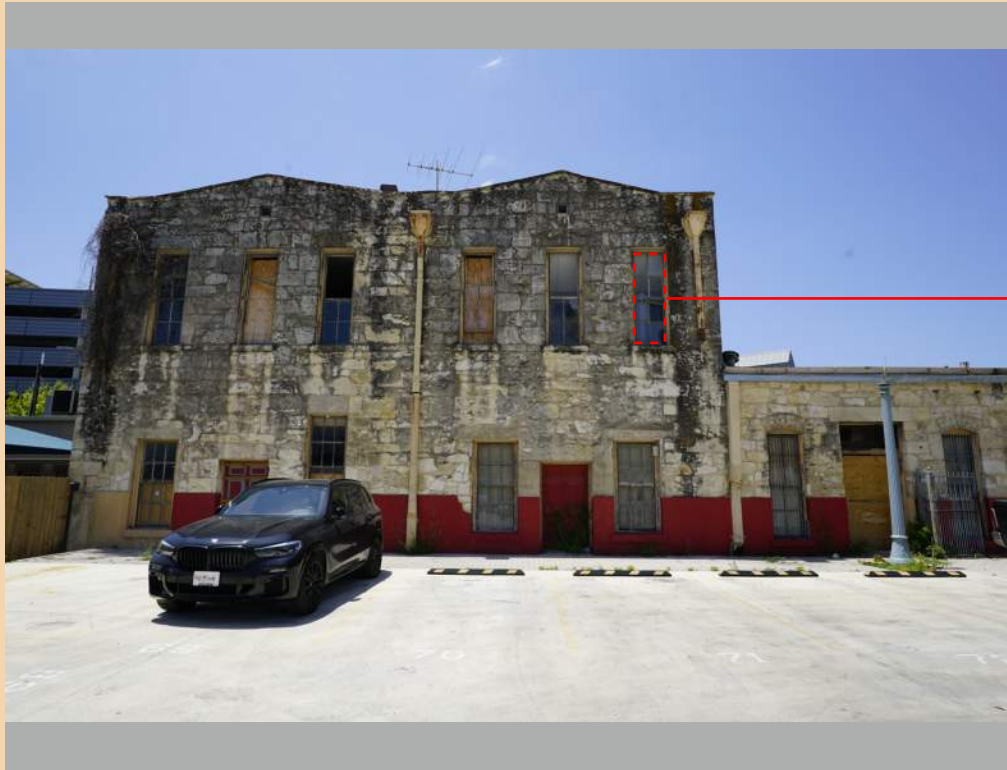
Building at 210-214 S Flores, East Elevation. Camera Facing Northwest. 12/2021
